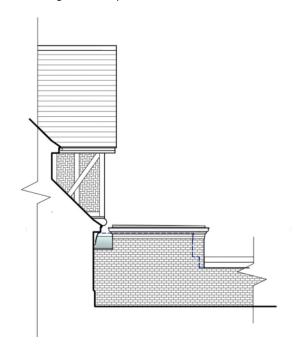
Proposed north-east elevation – note the high section of glazing to preserve the legibility of the bracket on the left hand side of the jetty
